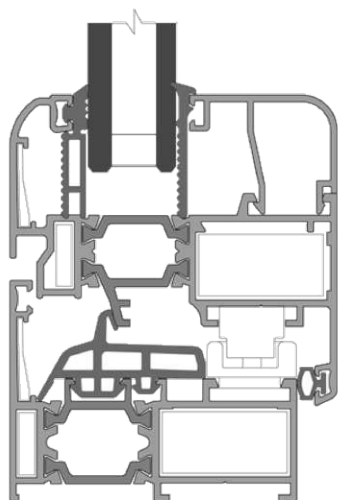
Vertical section of an aluminium window's frame with thermal break
